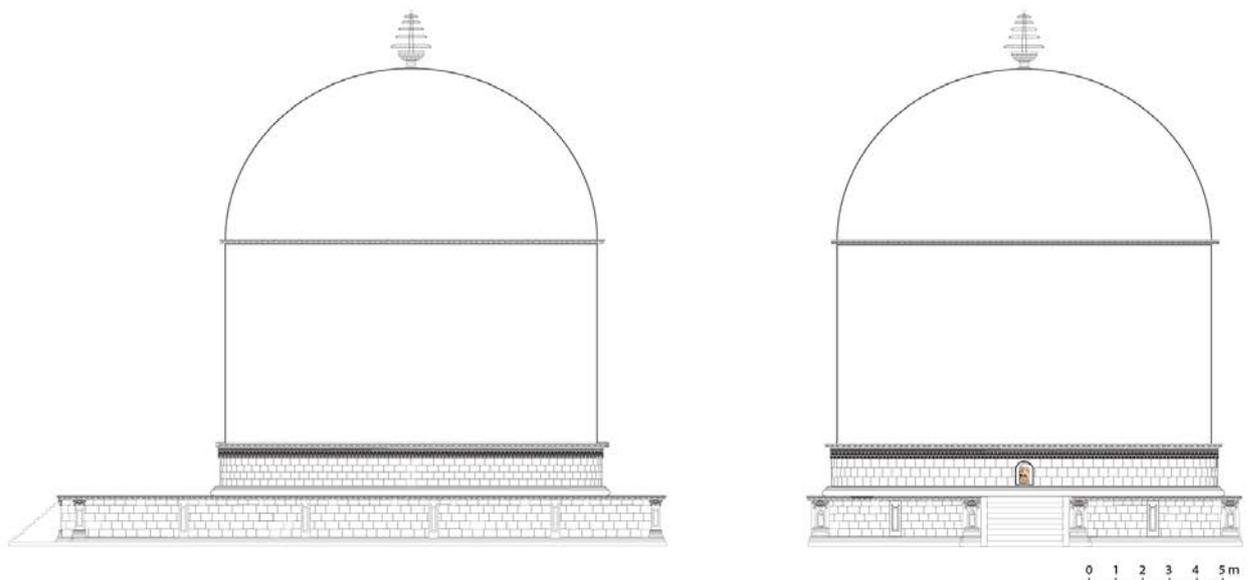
Reconstruction of the Zurmala Stupa (Drawing & tracing by author)
